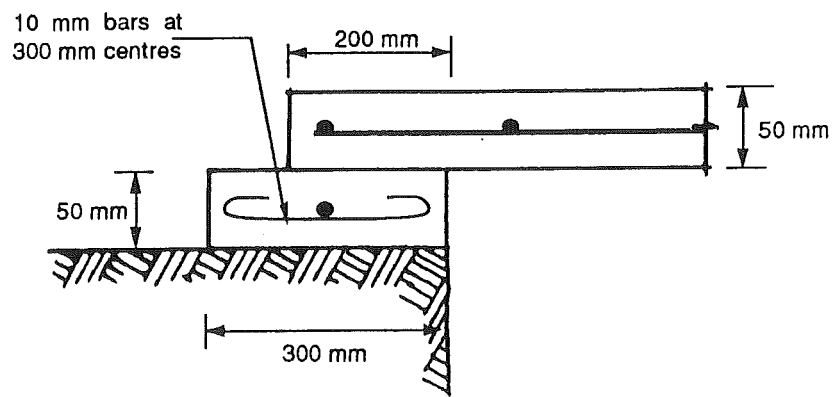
A DETAILS OF SQUAT TYPE COVER SLAB
